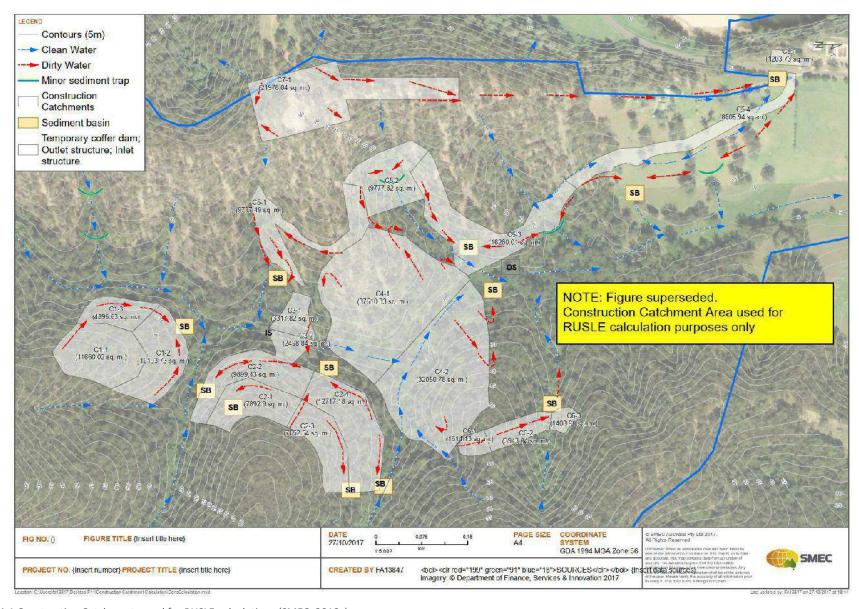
Construction Catchments used for RUSLE calculations (SMEC, 2018c)
